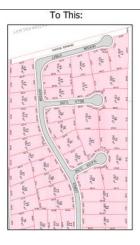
Proposed Subdivision Arrangement MODDA052/22
